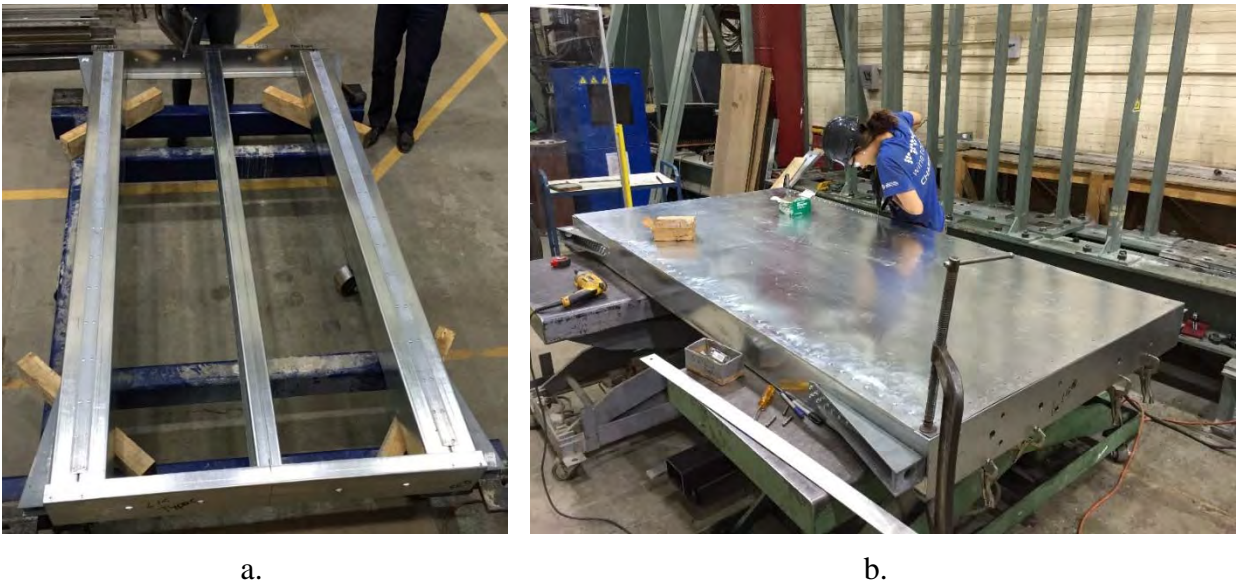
Double-sheathed configuration: assembly of the framing members, a. chords studs, field stud and tracks, and b. fastening of first sheathing panel
